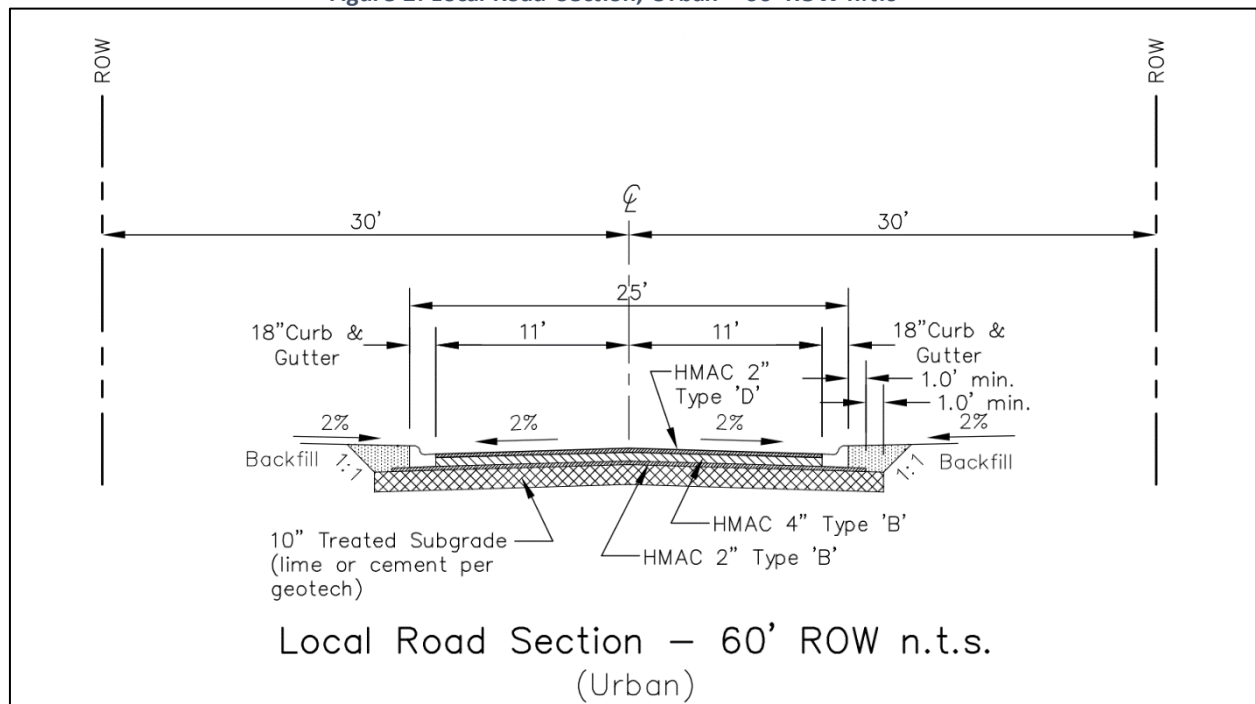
Local Road Section, Urban – 60' ROW n.t.s
